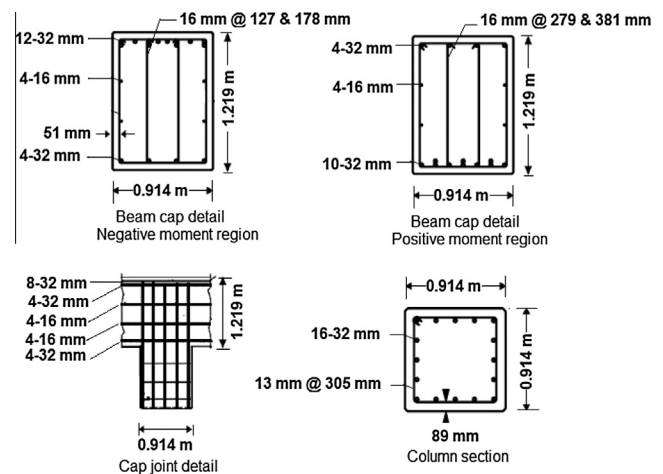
South Temple Bridge bent reinforcement details (adapted from [6]).
